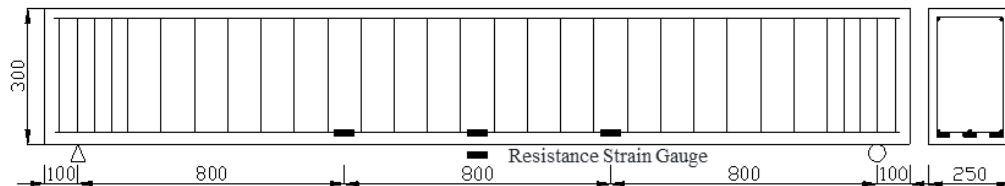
Layout diagram of steel reinforcement strain measurement points (Unit: mm)
